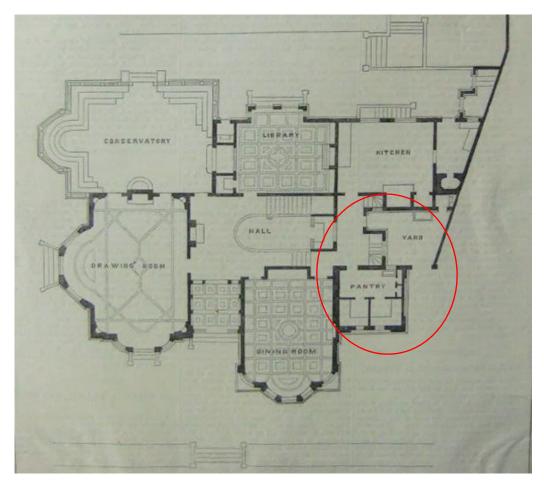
1868 Original Ground Floor Plan and raised Garden platform.
